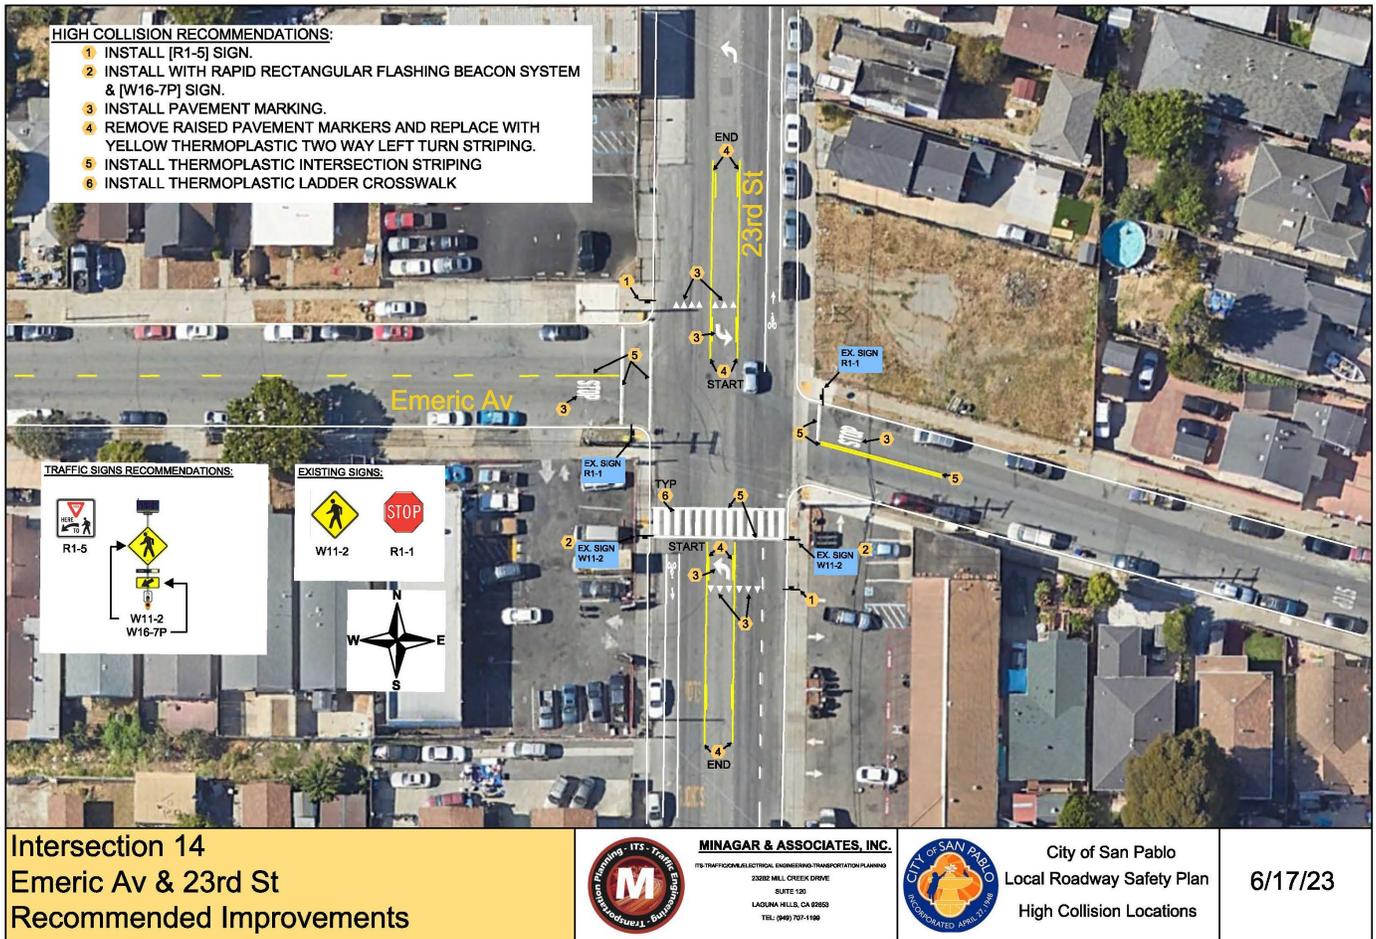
Intersection 14- Emeric Av & 23rd St Recommended Improvements
